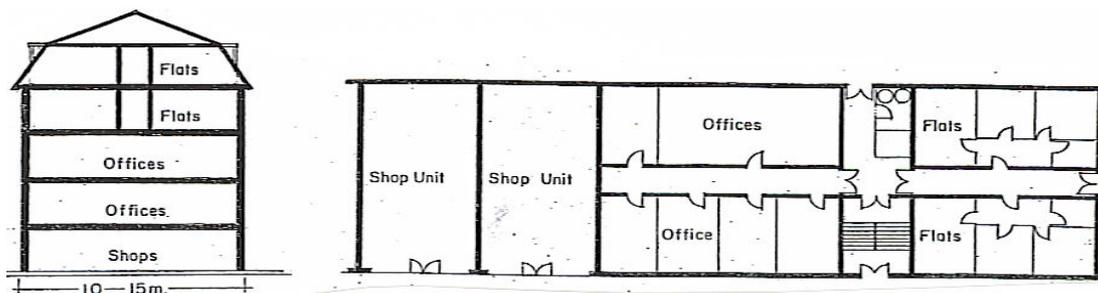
Adaptable building structures with a shallow floorplan offer greater scope for flexibility of use.
